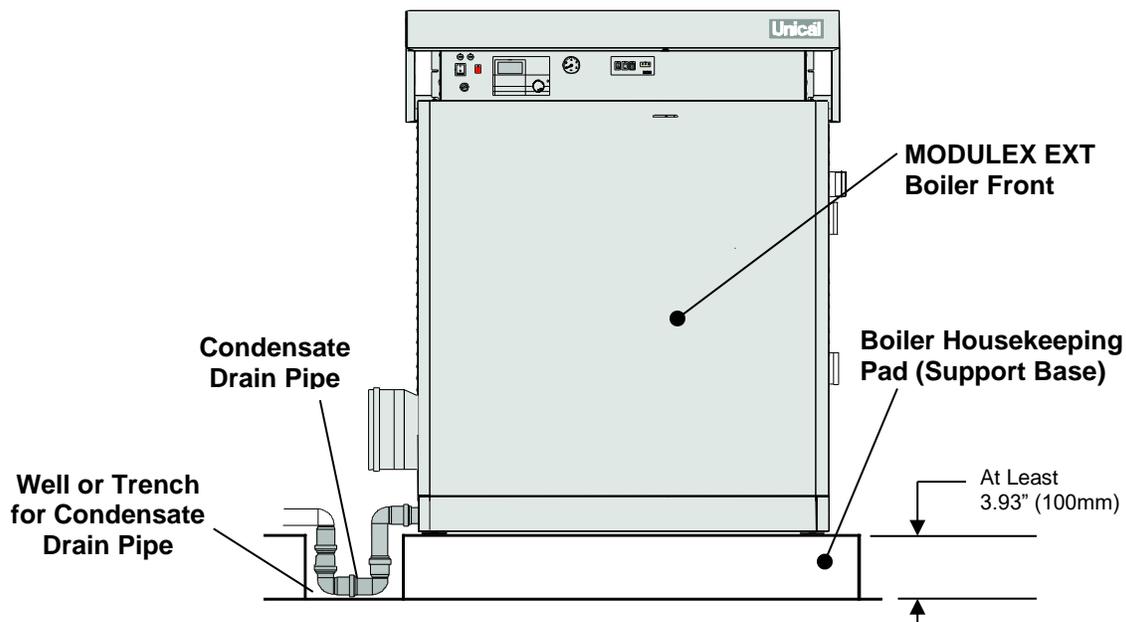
Boiler (Front View) on Housekeeping Pad with Condensate Drainpipe
